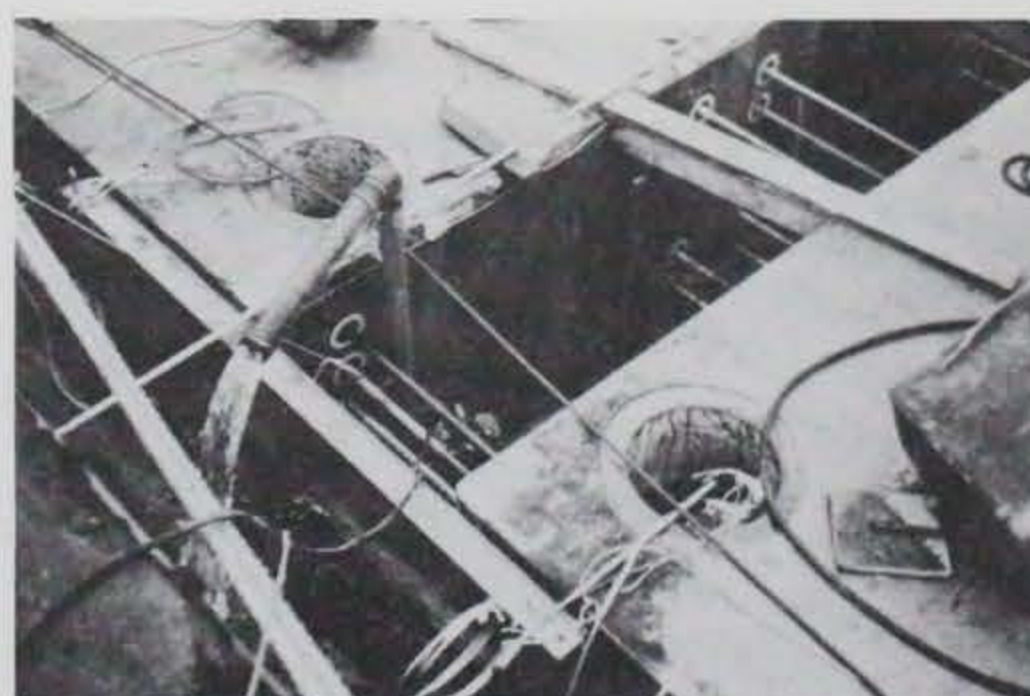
Photo depicting Dywidag 1-1/4-in.-diam. steel bars and 1/4-in.-thick Fabrieka rubber pad in place.
